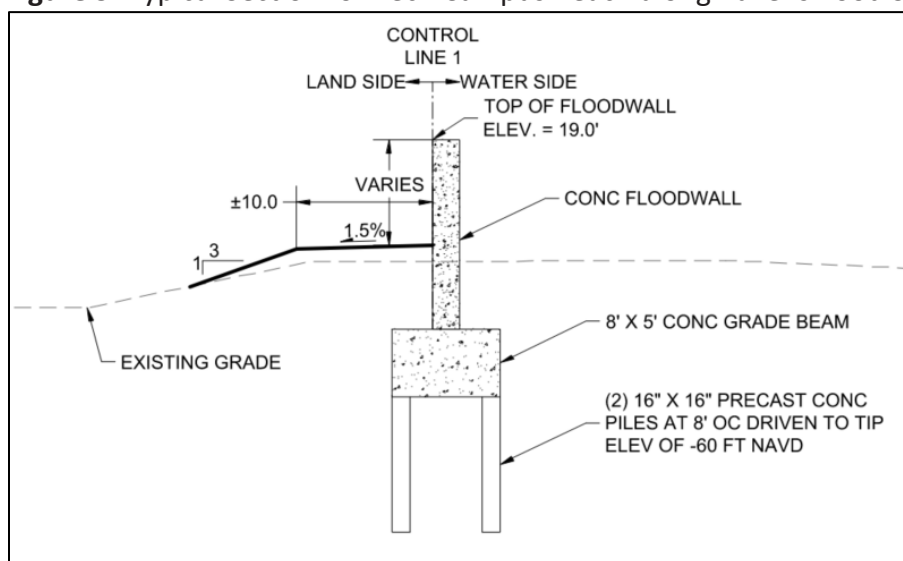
Typical Section for Tech Campus Reach along Ravenswood Slough¹⁷
